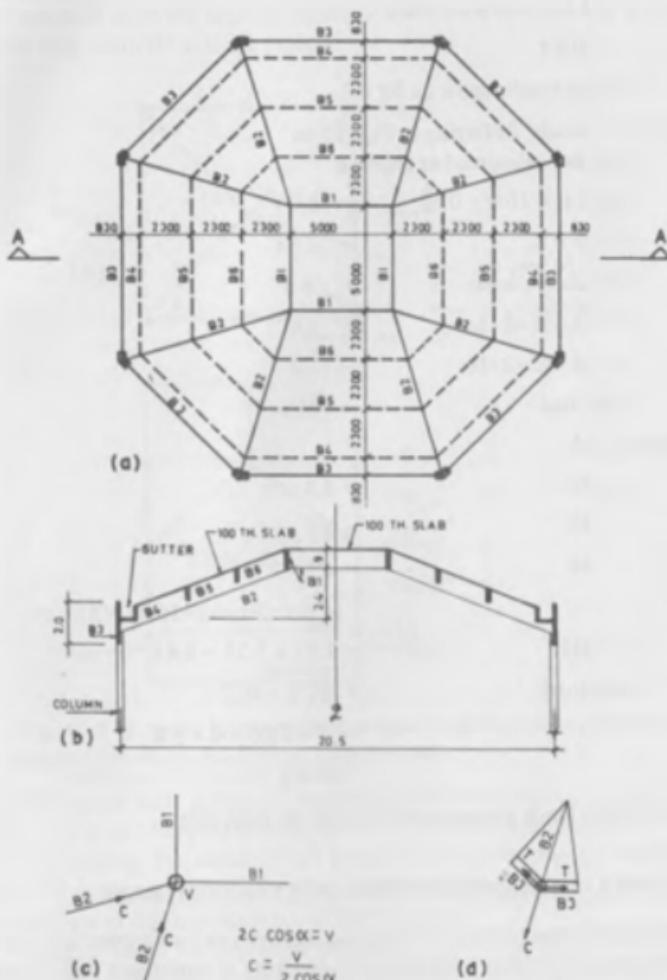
Pyramidal roof on an octagonal base. (a) Plan; (b) Section A-A; (c) Joint V; (d) Joint B3.
